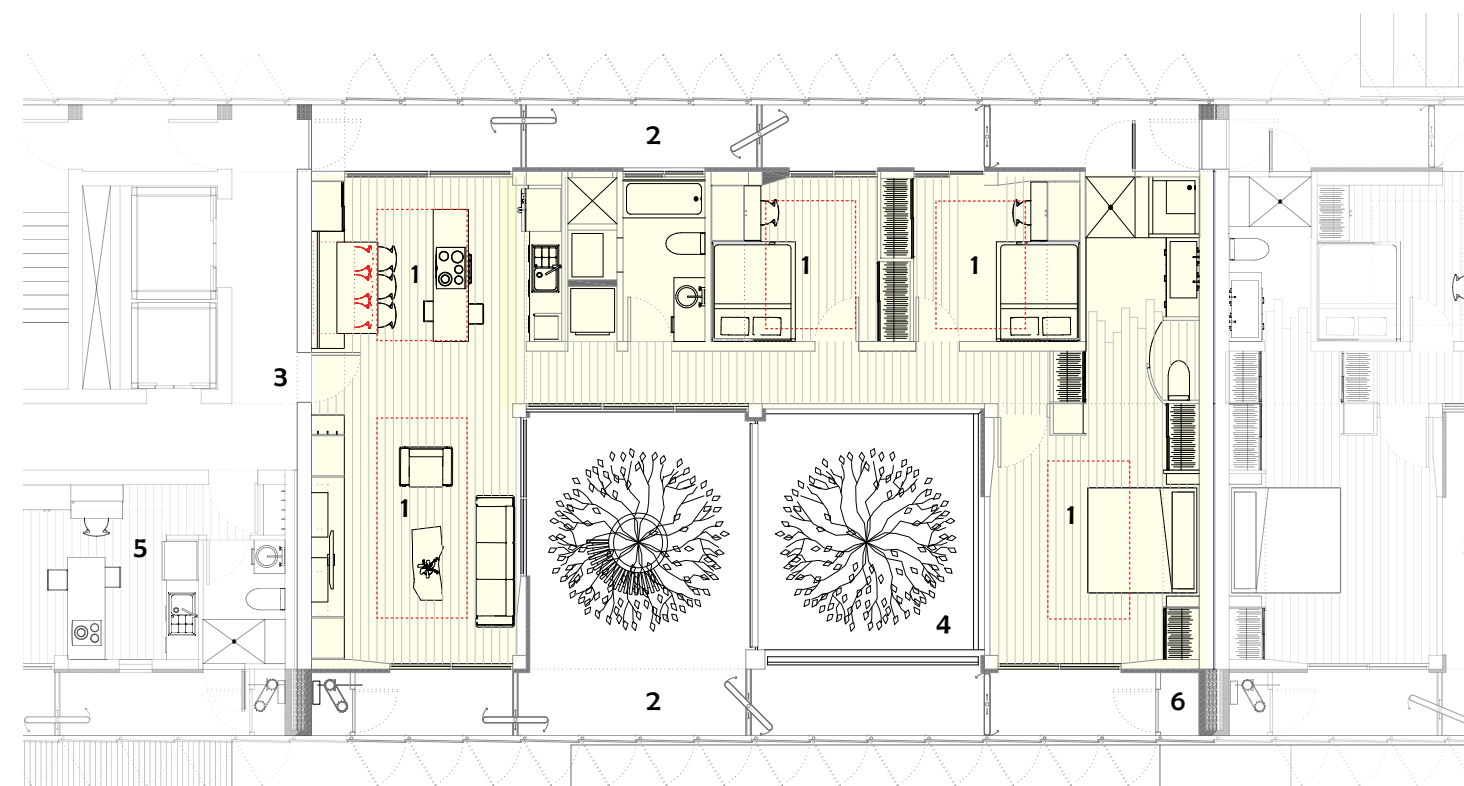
Plan of a typical 3 br. unit with left half of the staggered 2 story space occupiable.
